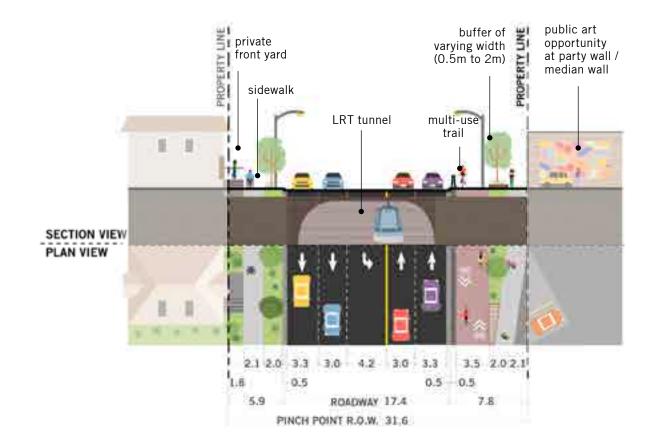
Typical cross-section for Segment F, looking westbound (1:400); dimensions align with section line
